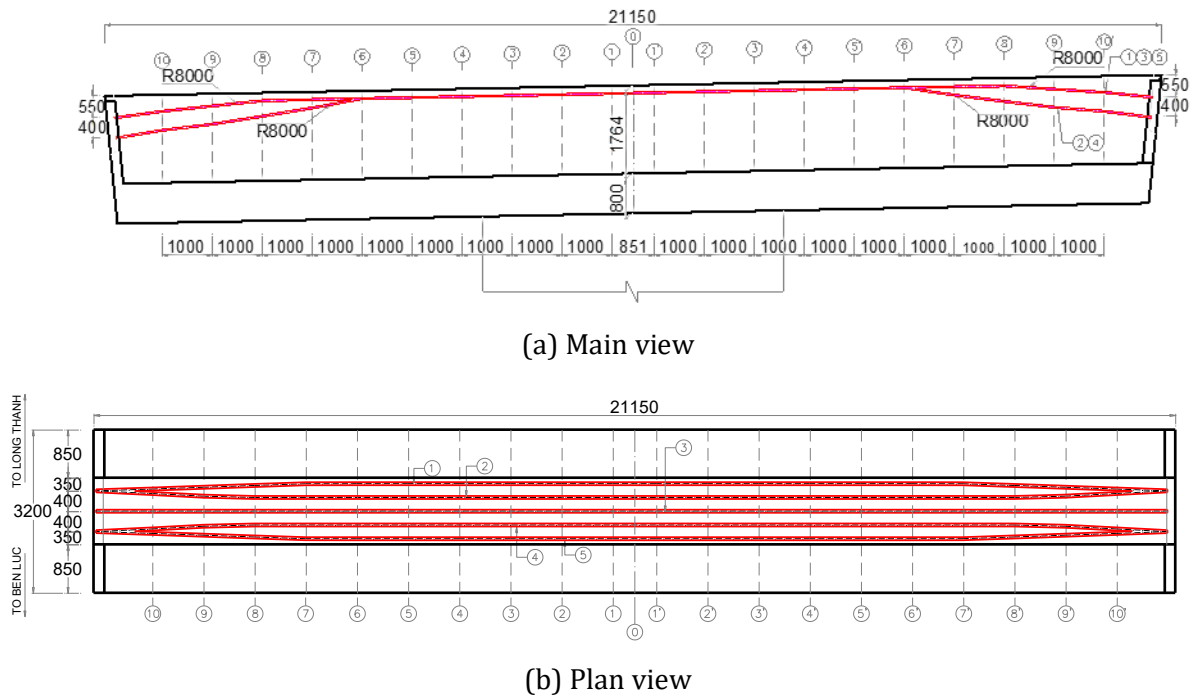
Layout of prestressing tendons in a typical PPC pier cap
